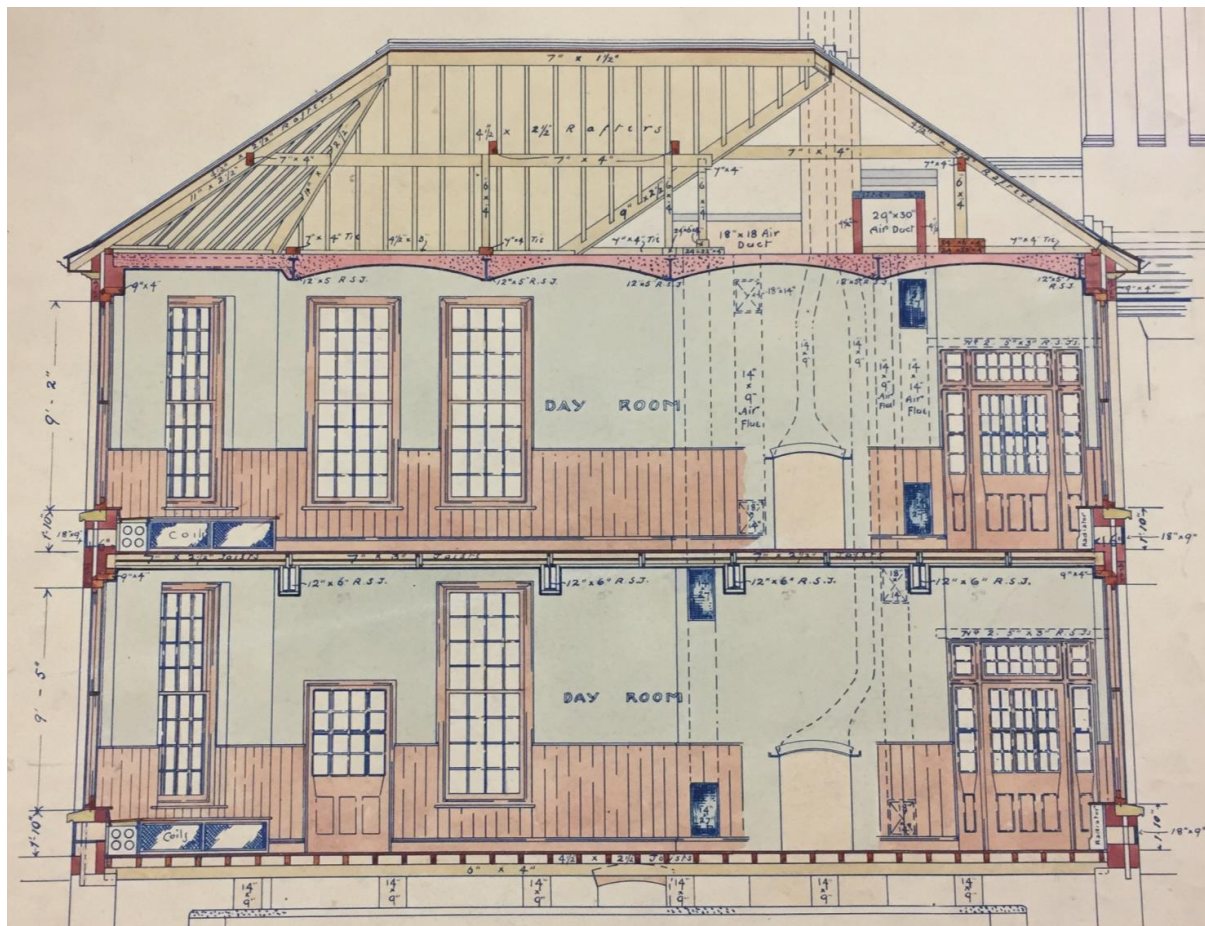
, (Britton, 2019) showing the timber framed constructed roof with the use of purlins and rafters, note the arched ceilings to the ceiling of the first floor, these being concrete fire-proof construction, Architects drawings referring to 'Dennett Concrete', being a patented fire-proof construction concrete, referred to as the Dennett's System or Dennett's Fire-proof Construction. (Rabun, 2000)
